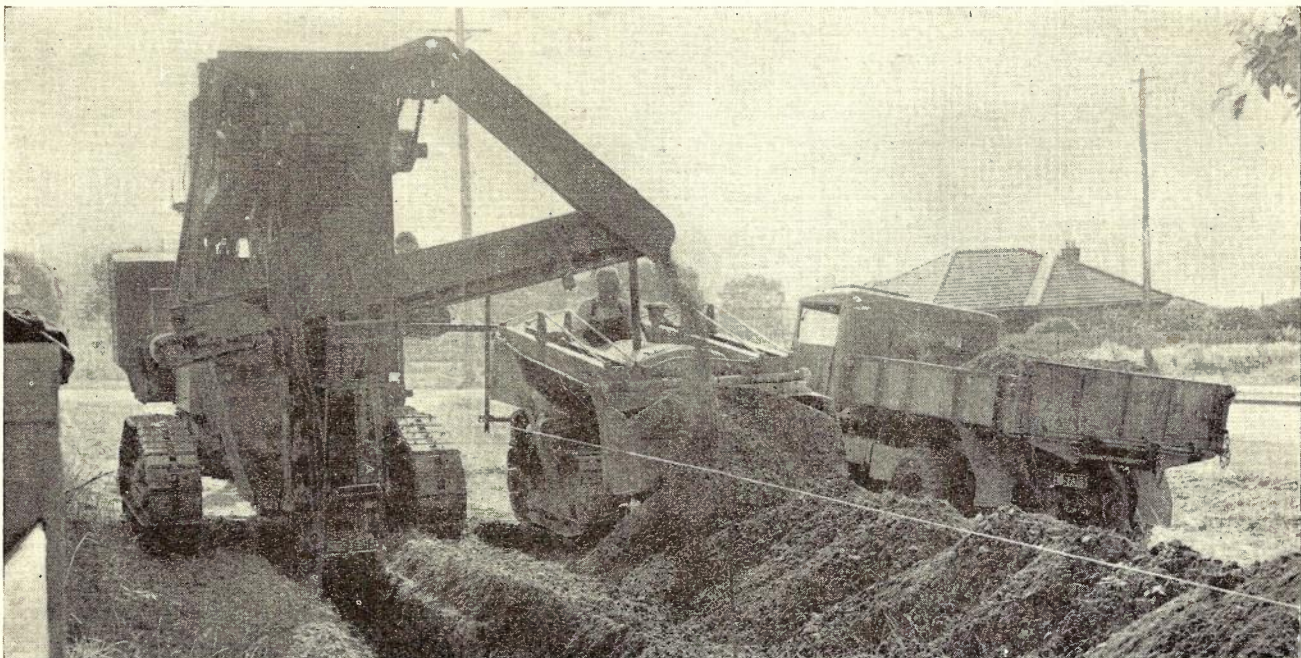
Trenching machine, front end loader and tipping truck as a complete excavation and spoil removal unit.
